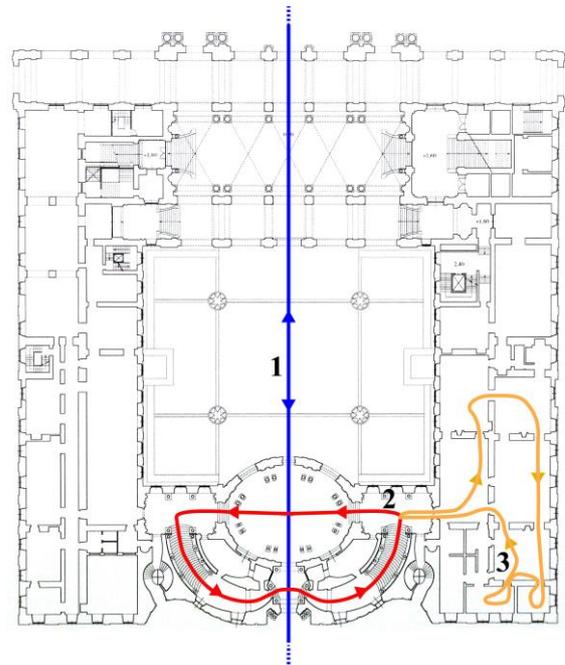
Floor plan of the building with layout of some VT routes (Editing by M. Russo)
